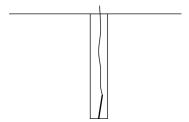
In a straight pile, rebar goes all the way to the bottom.
